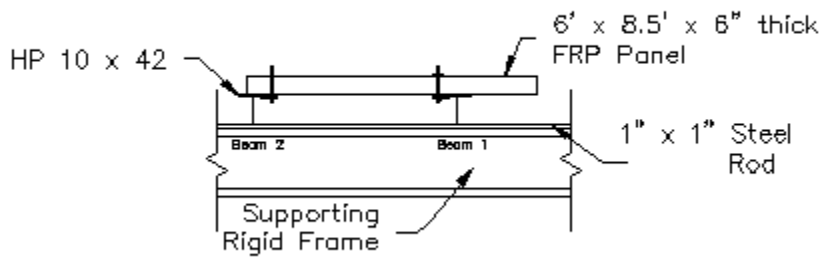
Cross Section of Simple Span/Cantilever Test - View Toward East
